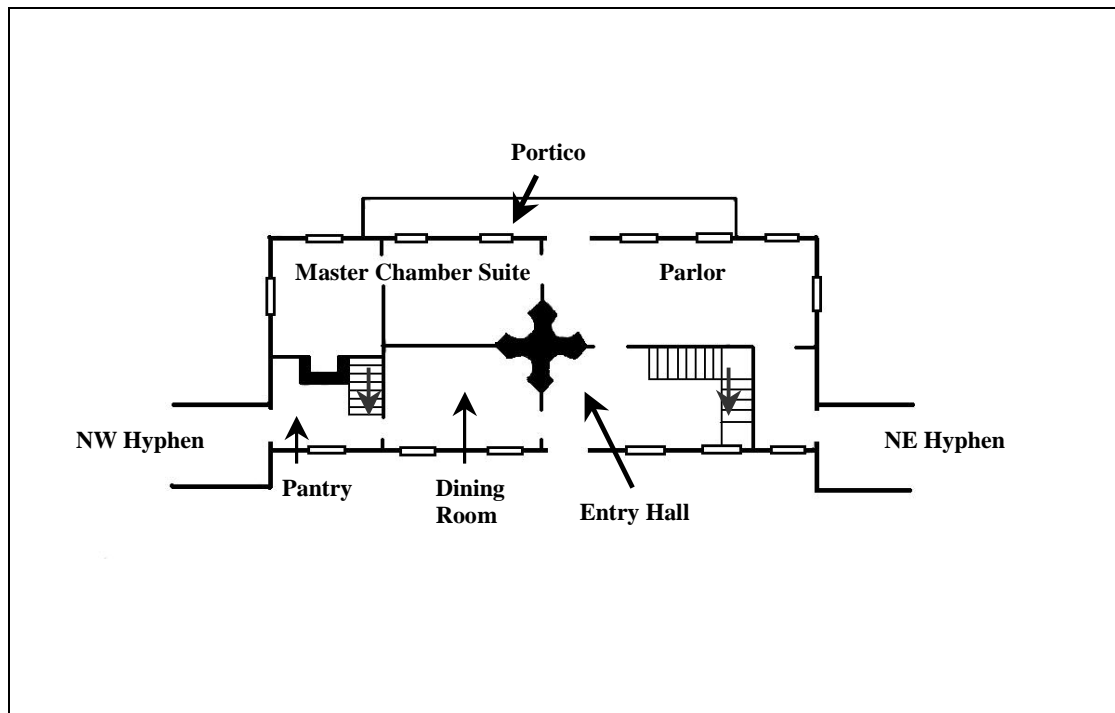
Proposed main floor plan of the Enchanted Castle.
